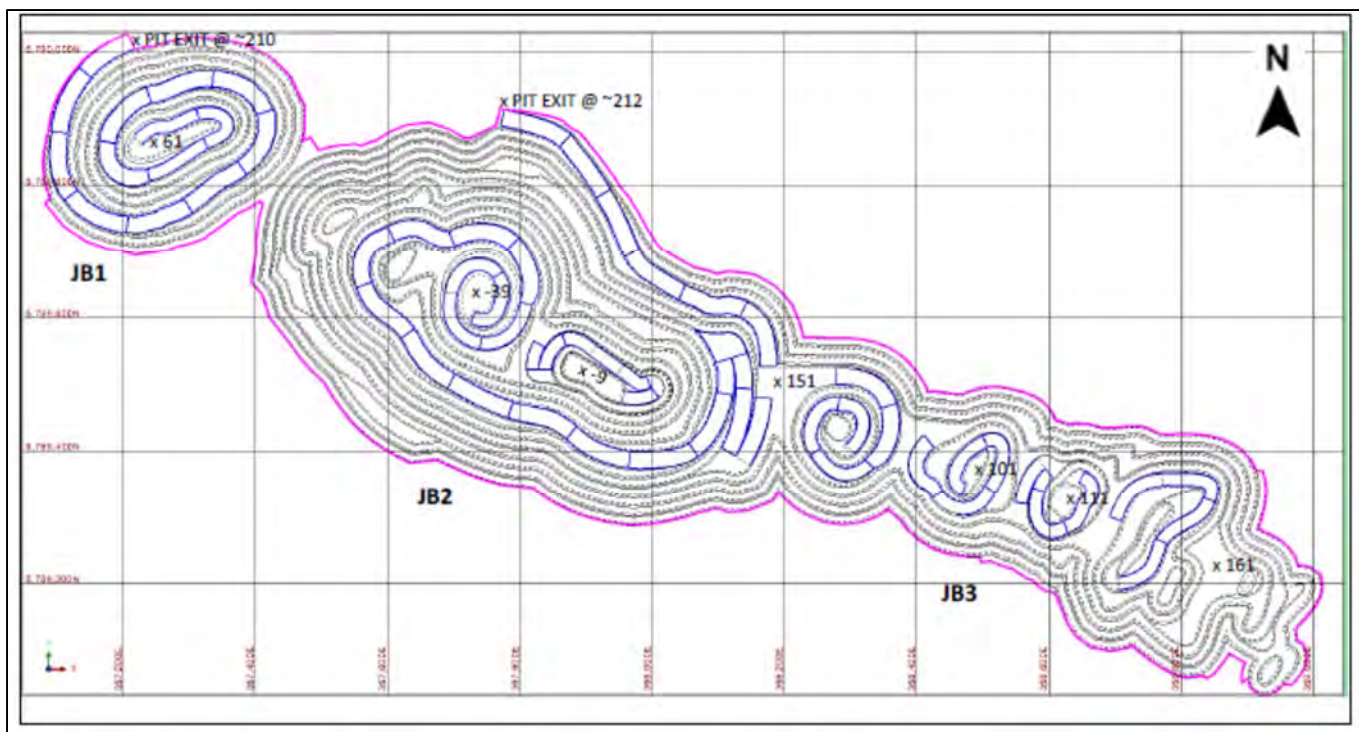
Plan view of the planned pit design, showing the three mining sectors JB1, JB2 and JB3.
